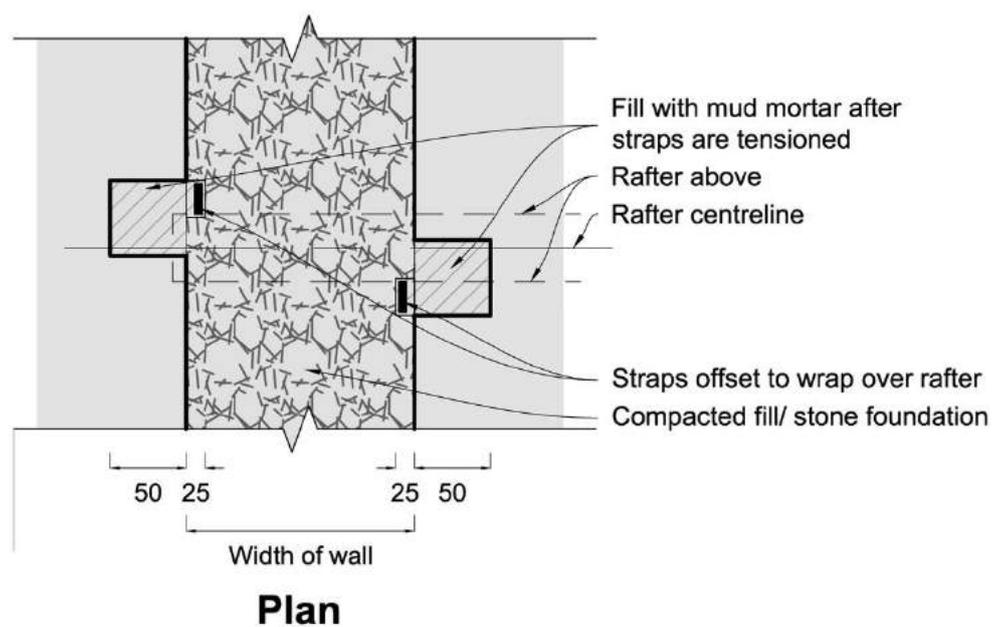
A plan view of a length of the foundation showing the position of off-set straps under a rafter and how they are set into the width of the wall.
